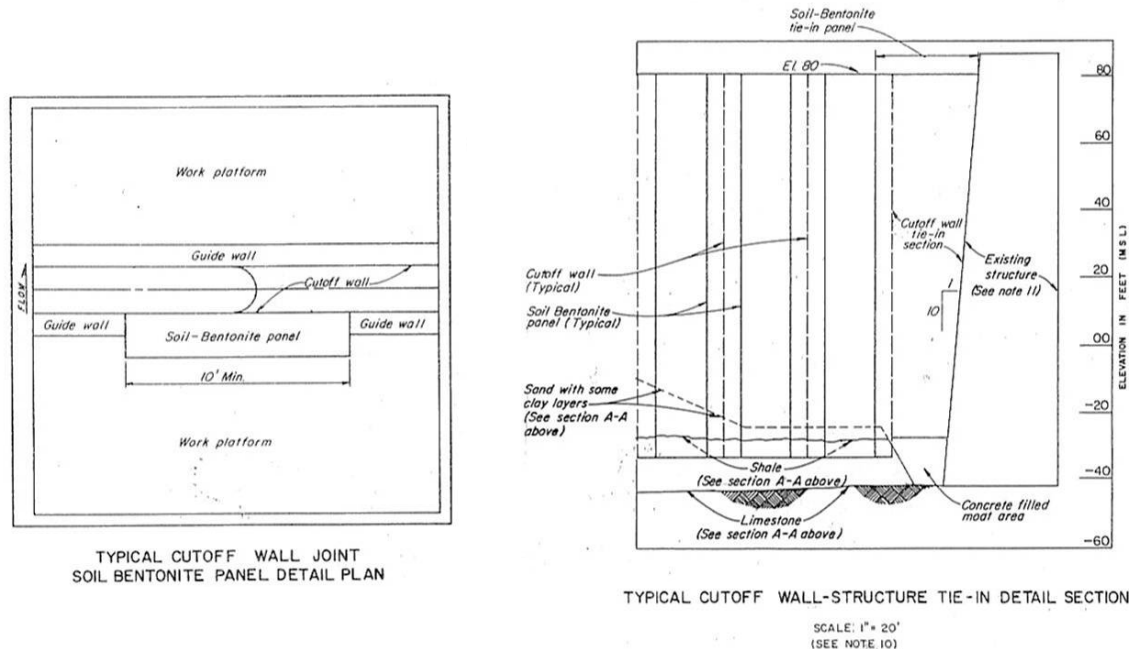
Typical Cut-off Wall Joint and Soil Bentonite Panel Detail Plan, St. Stephens Dam, SC (USACE, 1984).
